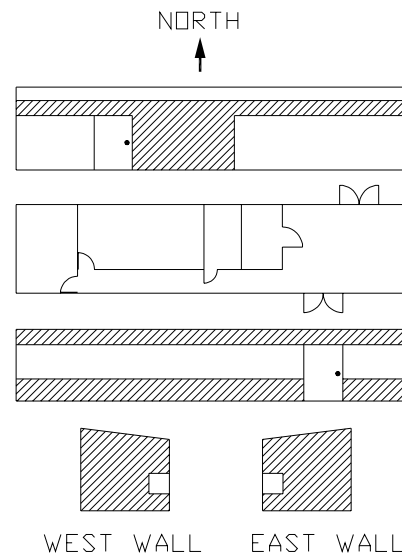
Non-Typical House Used in the Simulation. (From top to bottom: south elevation, floor plan, north elevation, west and east elevations)
